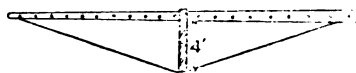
TRUSSED LADDERS. ONE STRUT.
